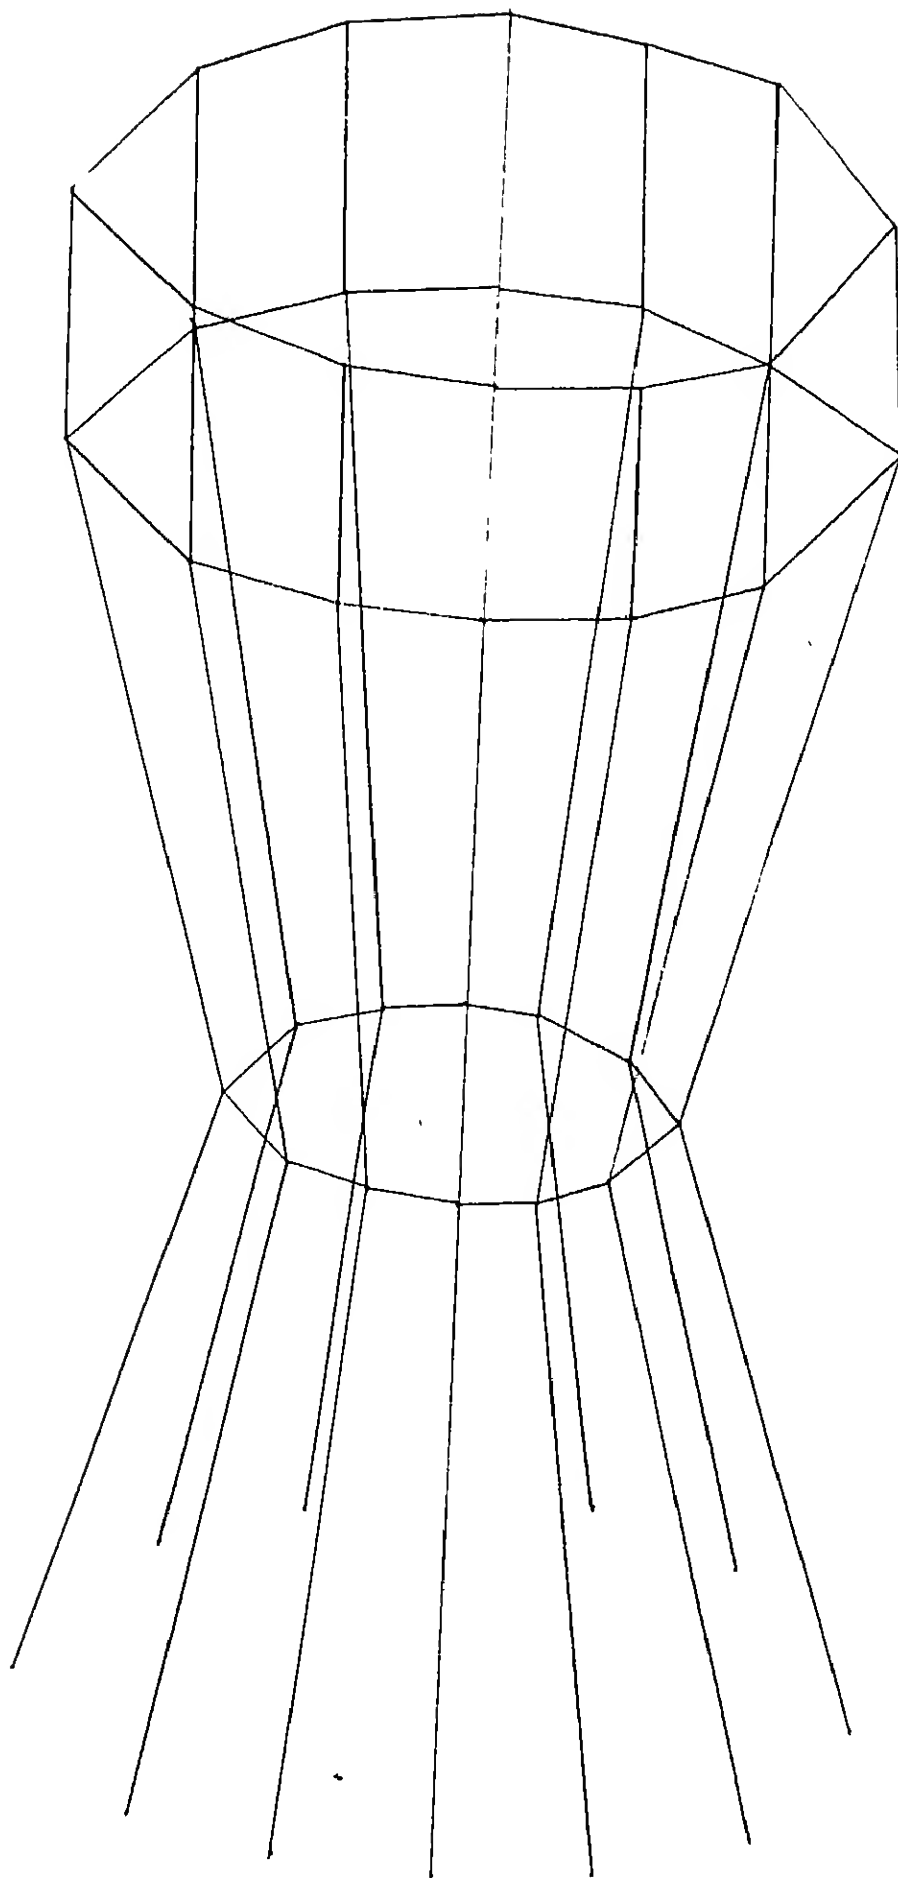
DIAGRAM FOR DETAILING OF REINFORCEMENT
